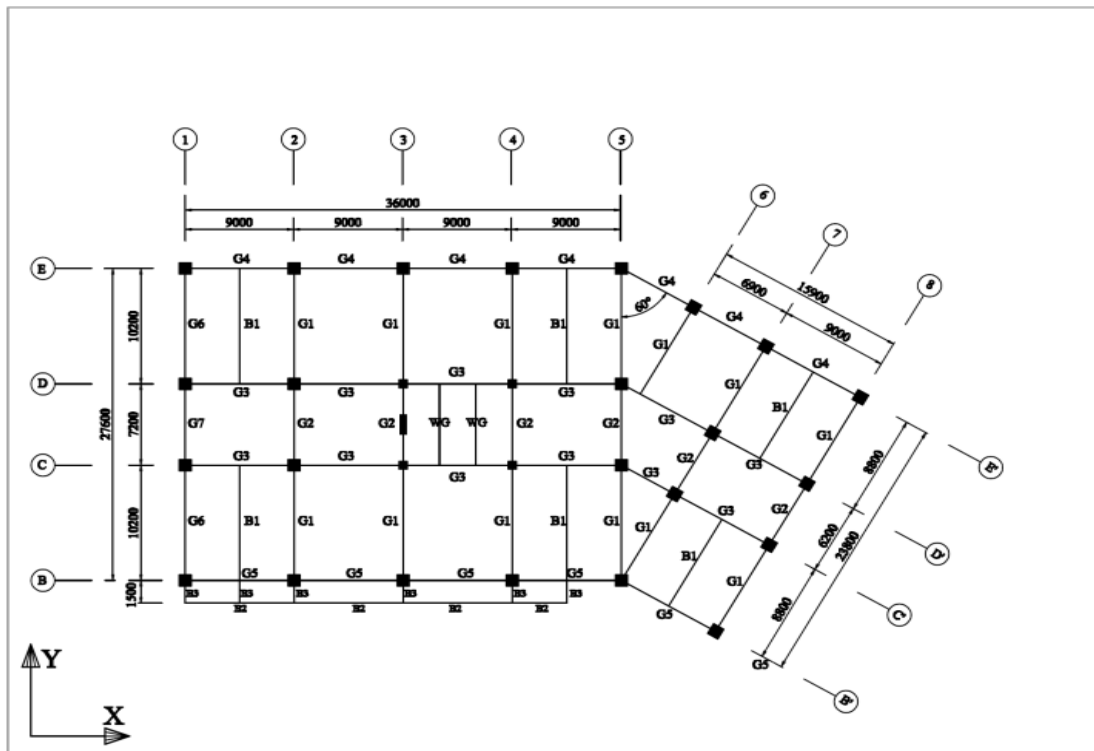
Plan layout of the girders and beams for the upper 17 storeys of irregular 20-storey, multi-bay RC building (all dimensions are in millimetres).
